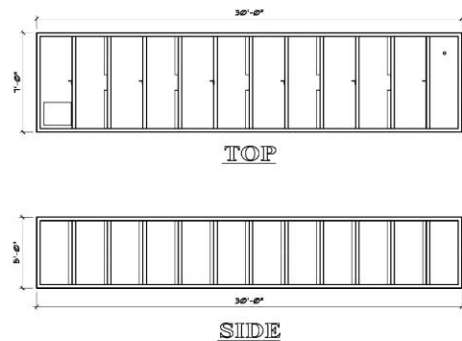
PONTOON "A" FRAMING DETAILS
